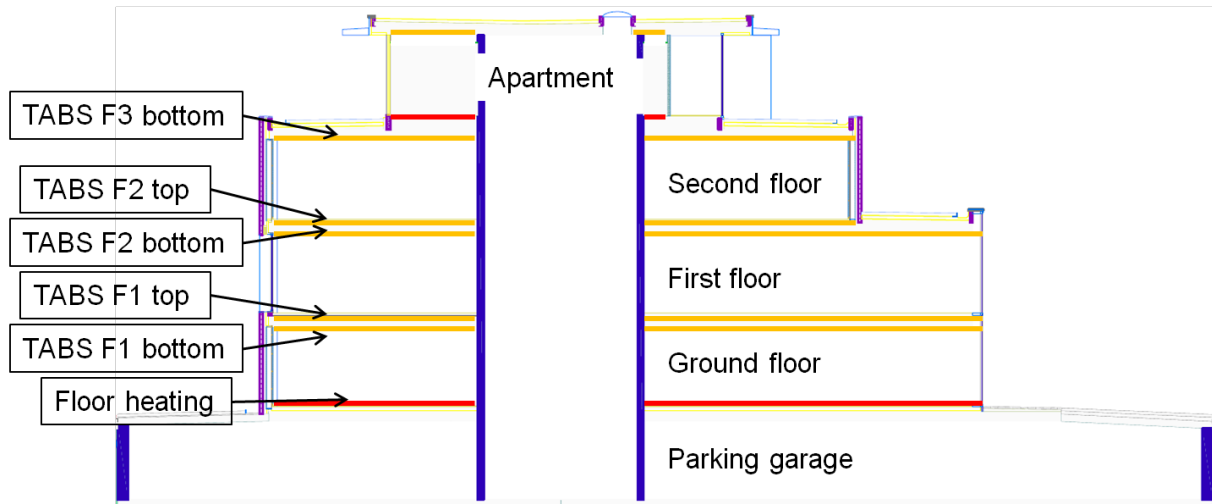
Scheme of thermally activated building components (floor heating: red, TABS: orange)
